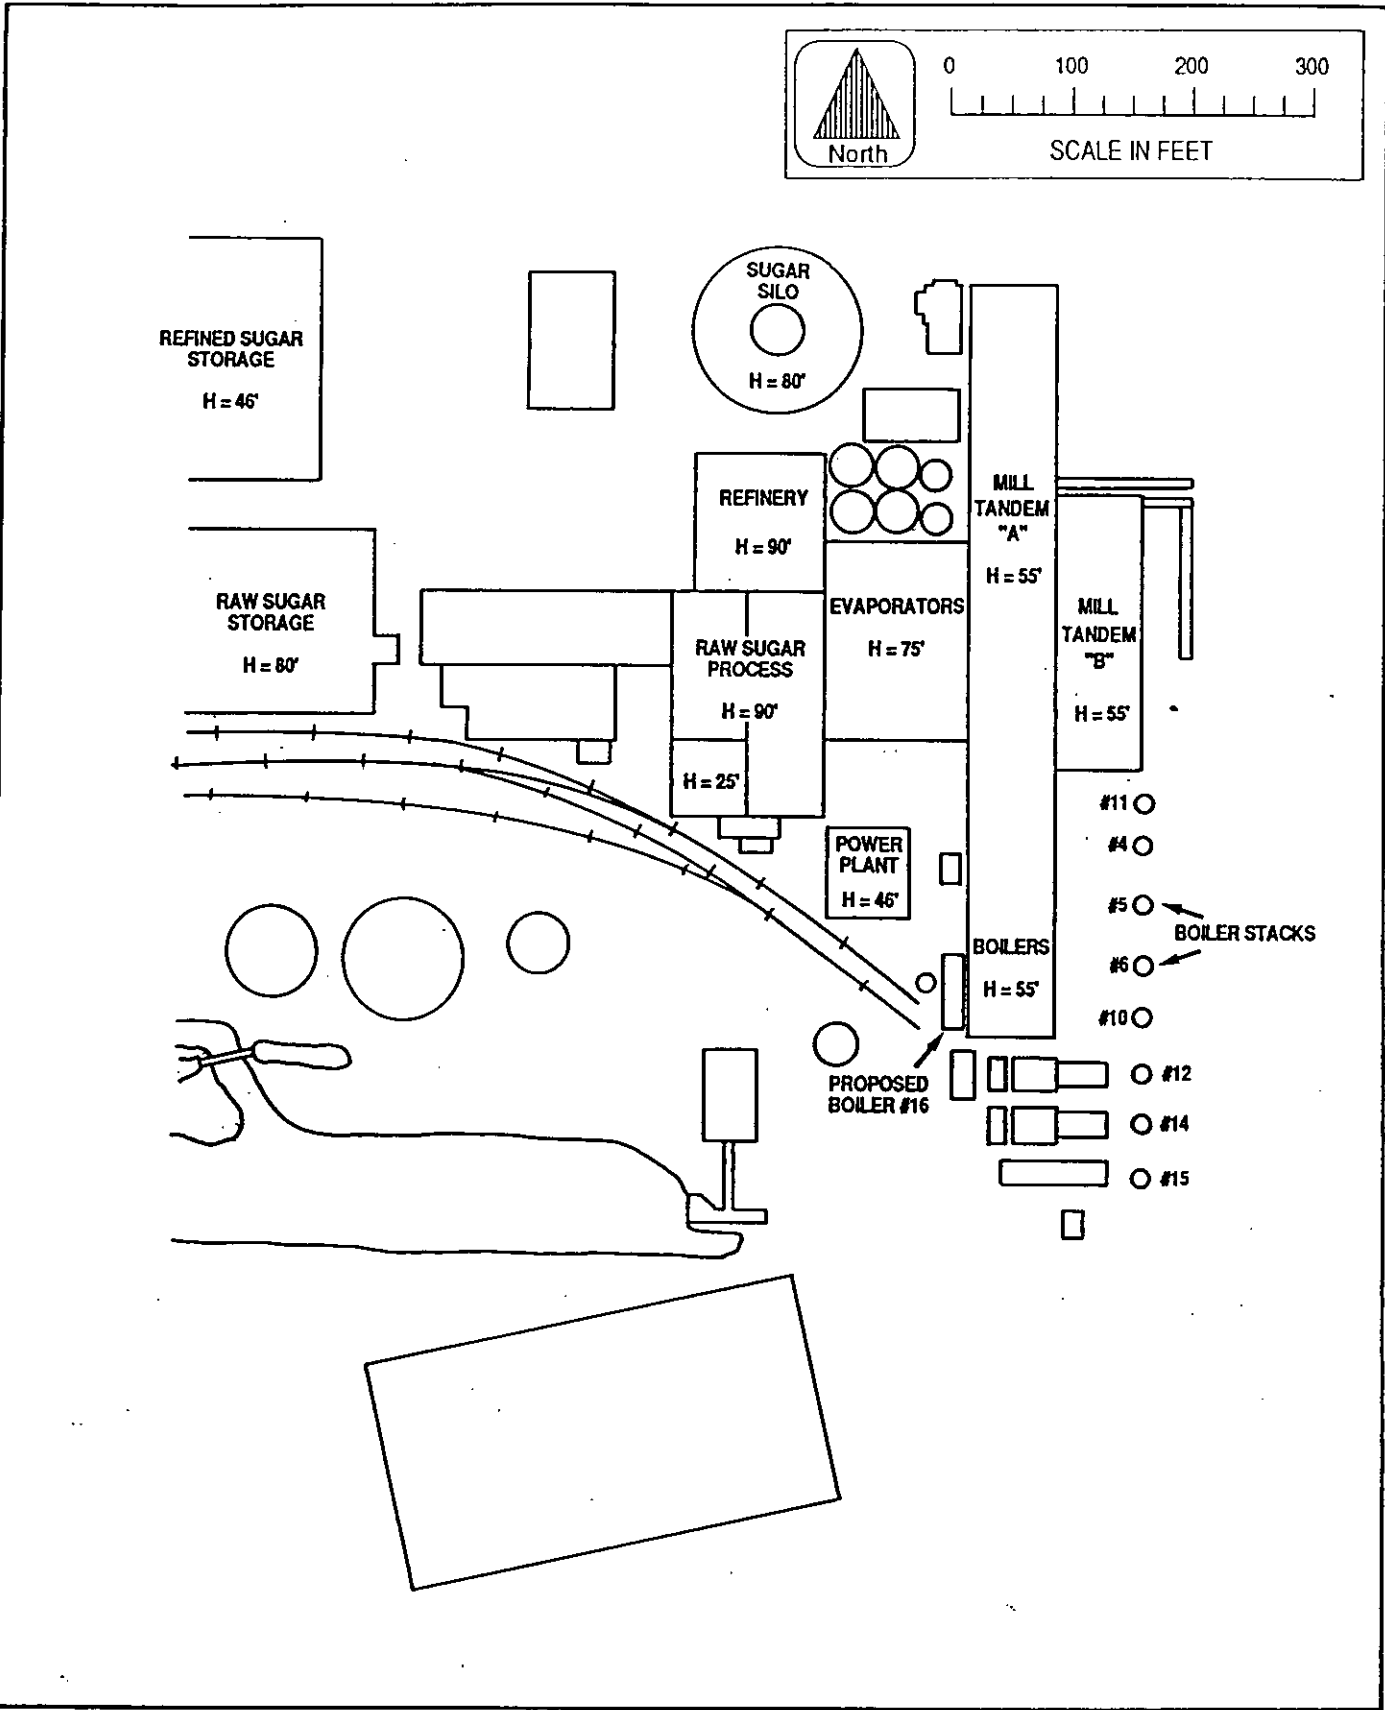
BUILDING HEIGHTS, OKEELANTA SUGAR MILL
